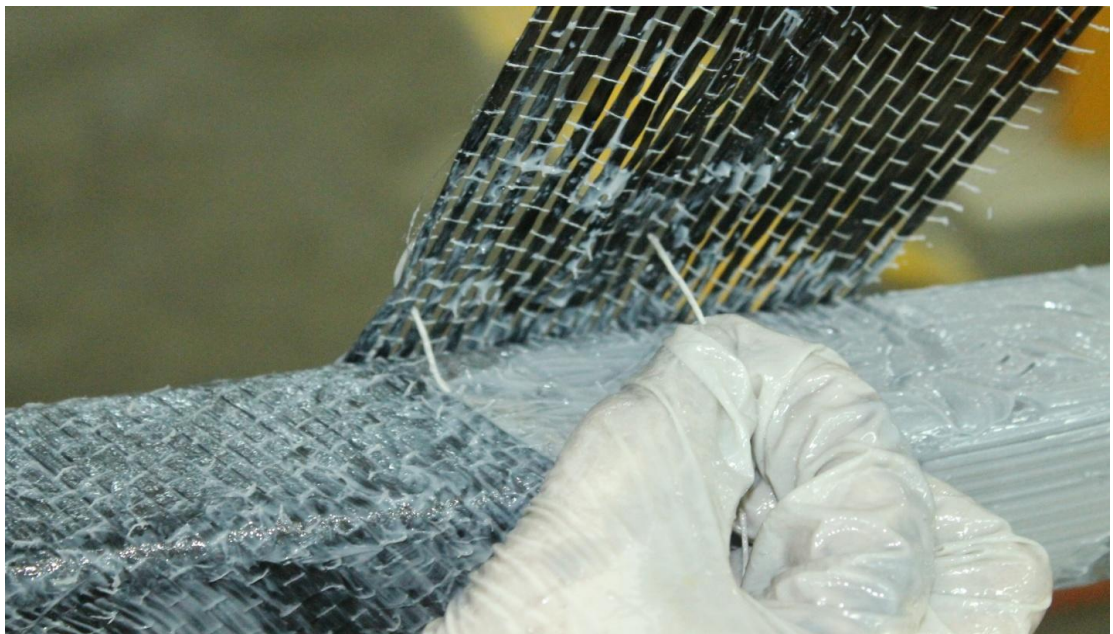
Strain gauge wires passing through the CFRP sheet
